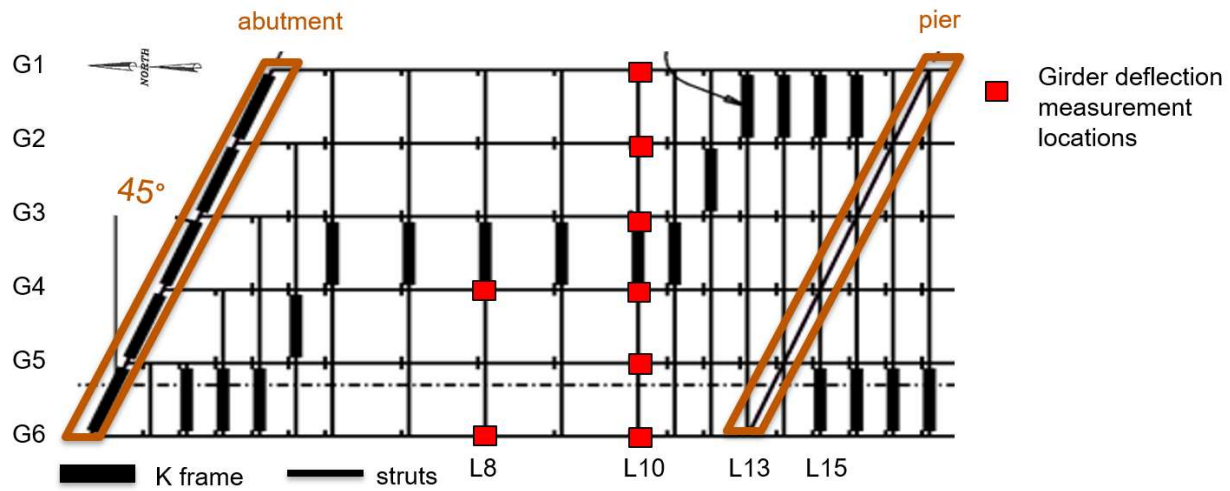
Chisholm Trail Span 1 Girder Displacement Layout
